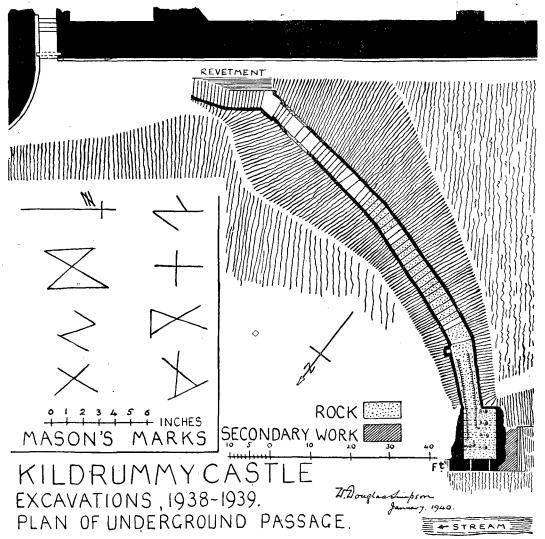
Kildrummy Castle. Plan of Water-Gate Passage.
